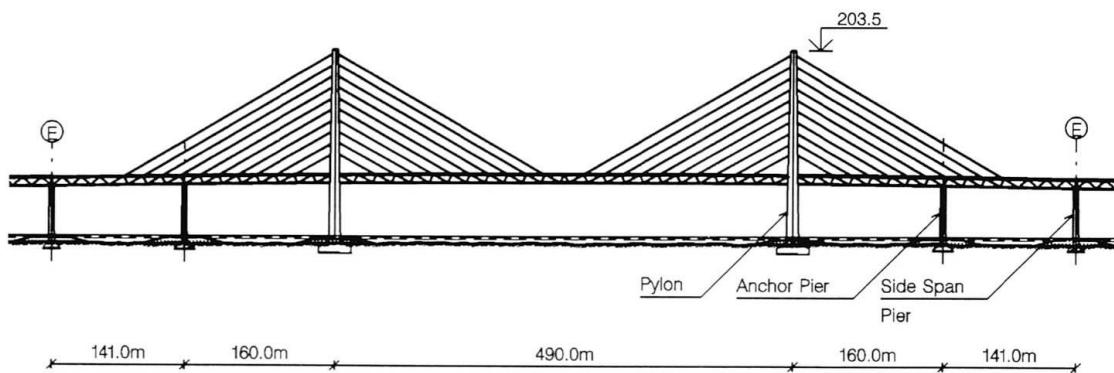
Öresund Link, Cable Stayed Bridge. Side view.
